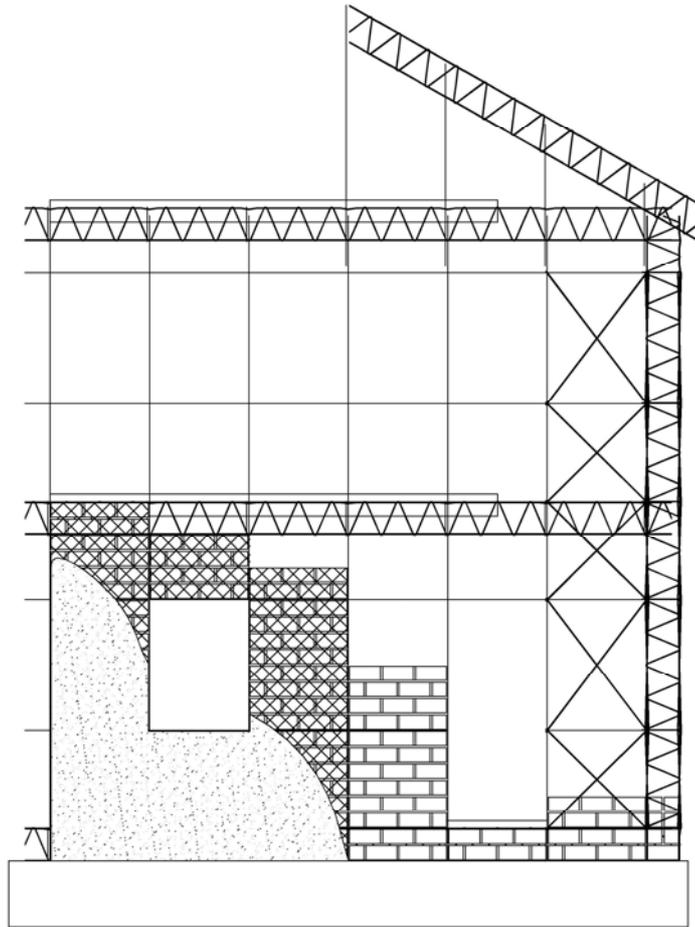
Elevation showing construction detail of Type 5 house: Vertical and horizontal ribs braced at the corners with diagonal wires. Earth infill between the vertical trusses and the bed-joint reinforcement. Rendering set on chicken wire fixed to the rib wires.
